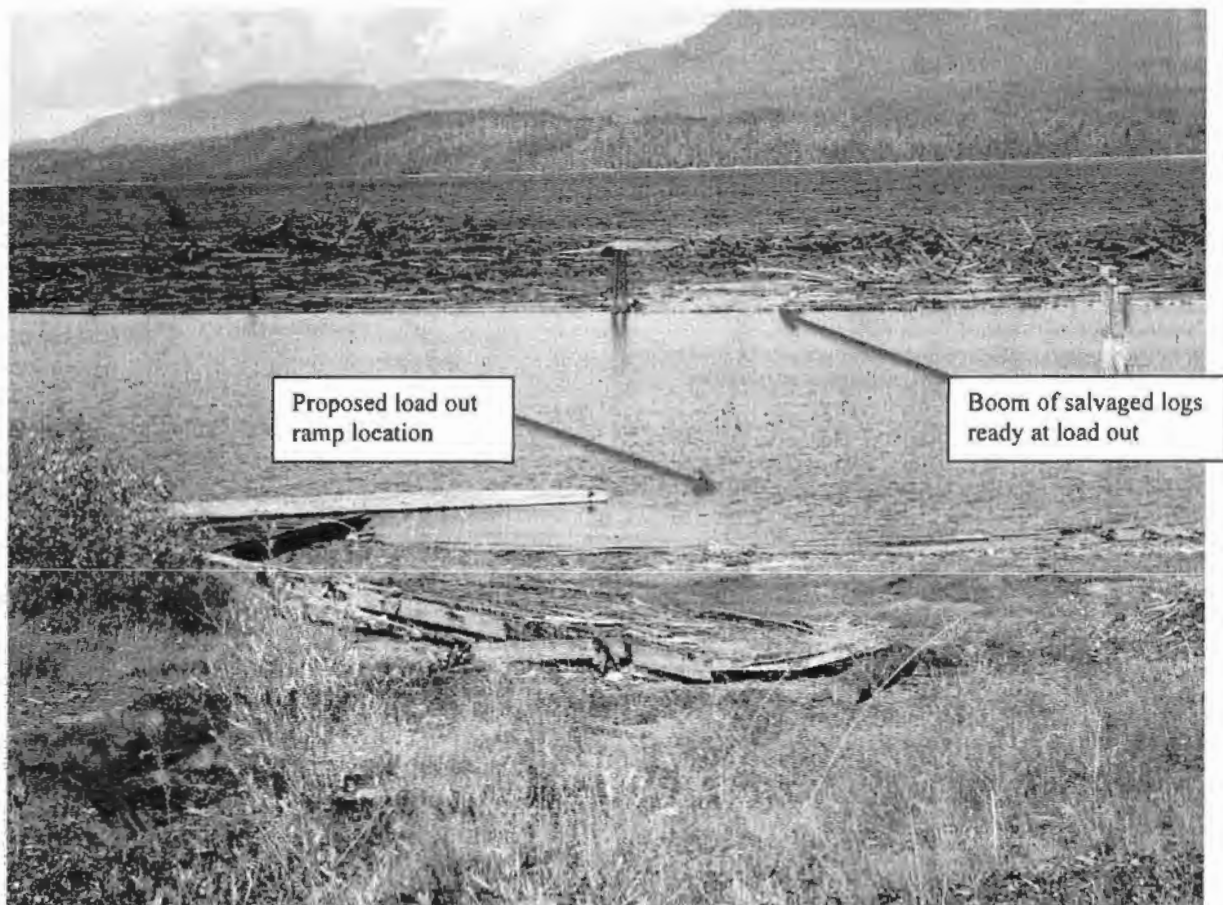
Existing boom of salvaged logs and proposed load out ramp location
